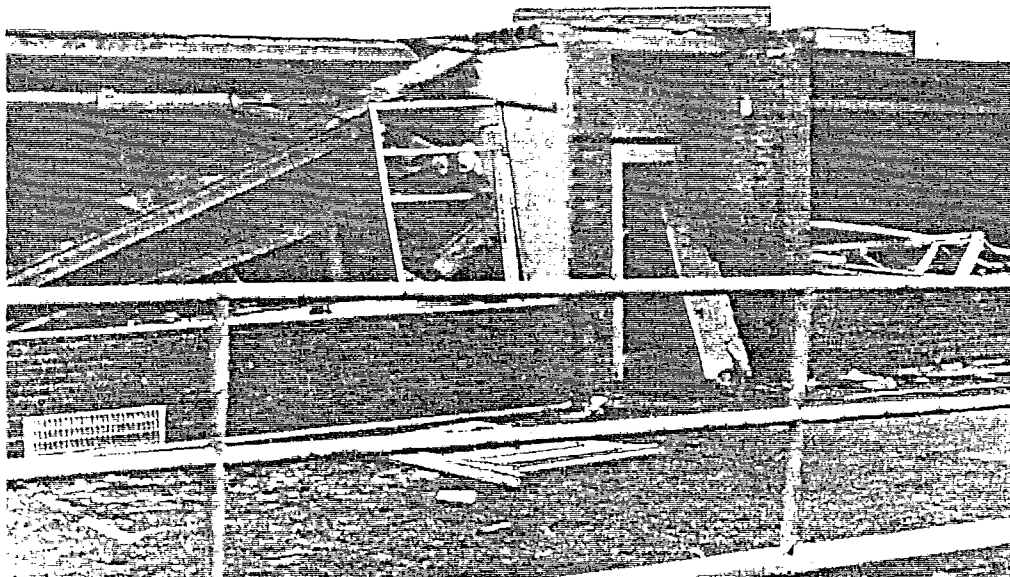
XENIA HIGH SCHOOL, ONE STORY CLASSROOM BUILDING. Hollow core roof slabs were uplifted.
